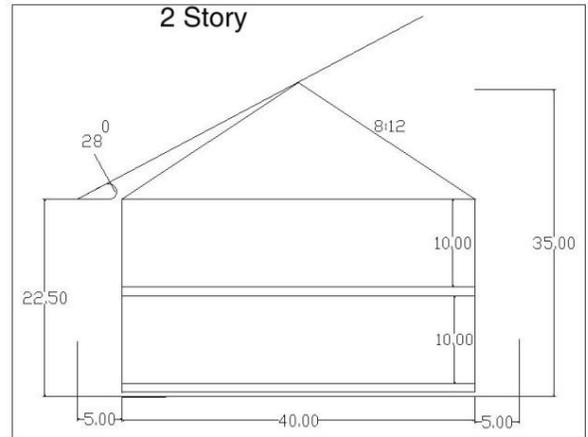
TWO-STORY GABLE-END ROOF MEETING SOLAR ACCESS STANDARDS
